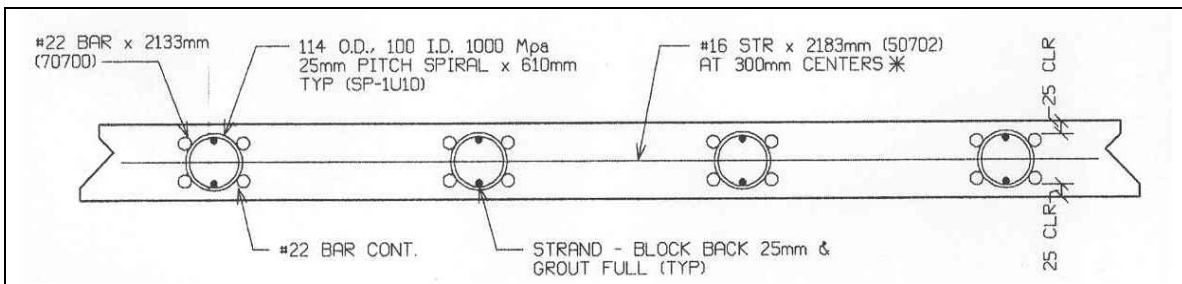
Typical NU-Deck panel section at overhangs (NDOR, 2003)
